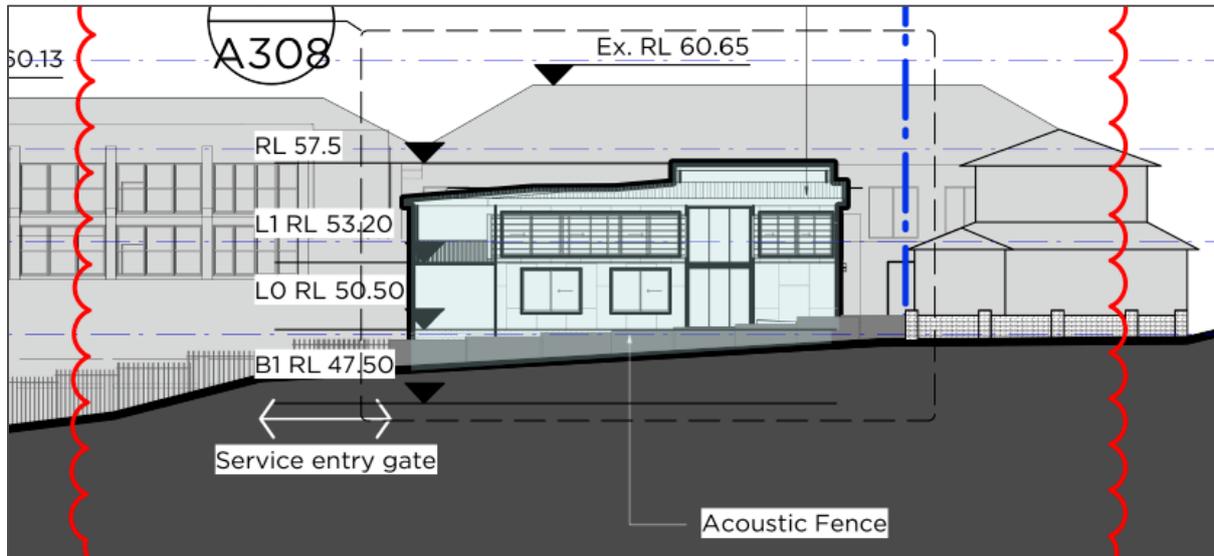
| Proposed Maintenance Building as viewed from Seaview Street (Source: Applicant's SRTS 2021)
